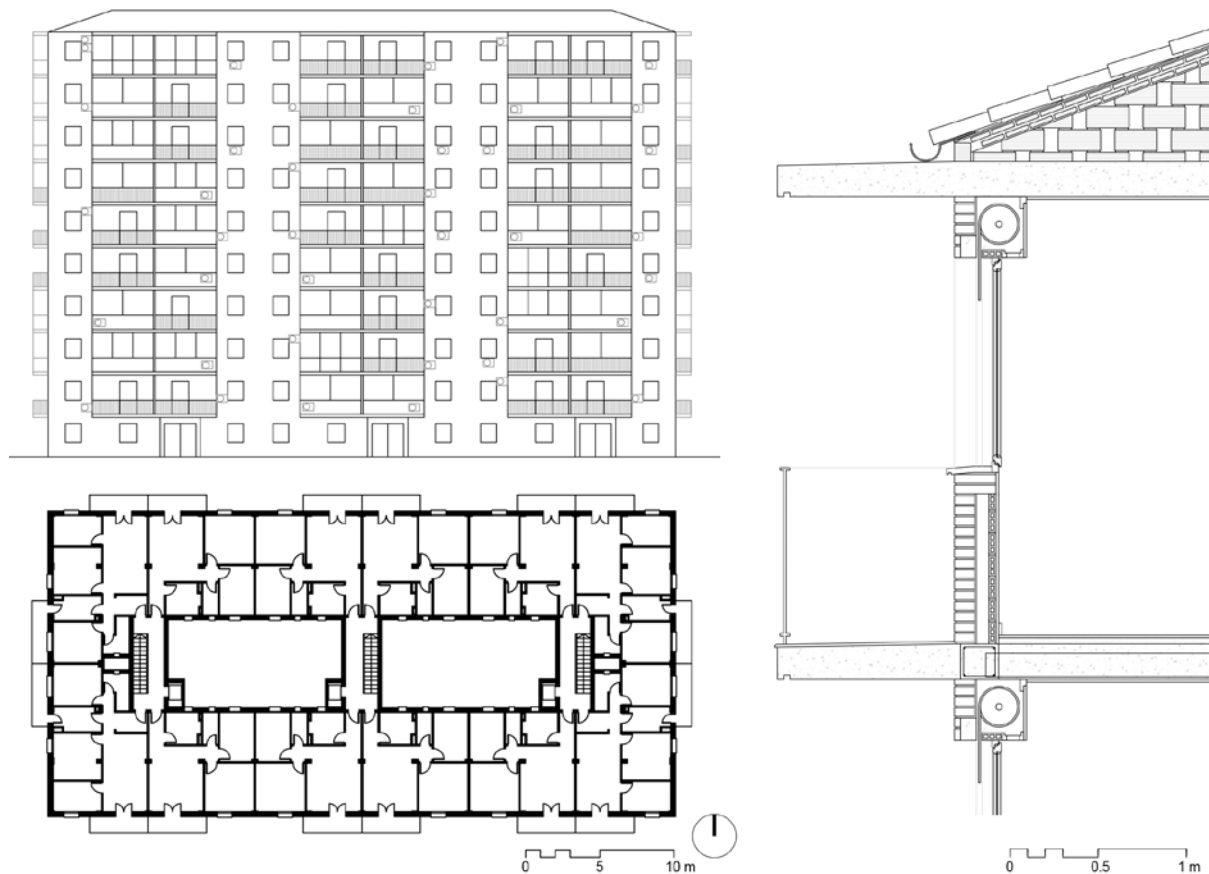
Layout of the existing building: elevation, floor plan and vertical section of the top floor [2].
